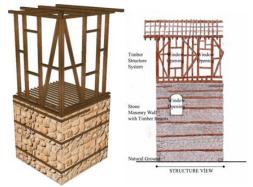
The building has stone masonry walls on the ground floor and timber frame walls on the upper floors. The inventory number is 99
